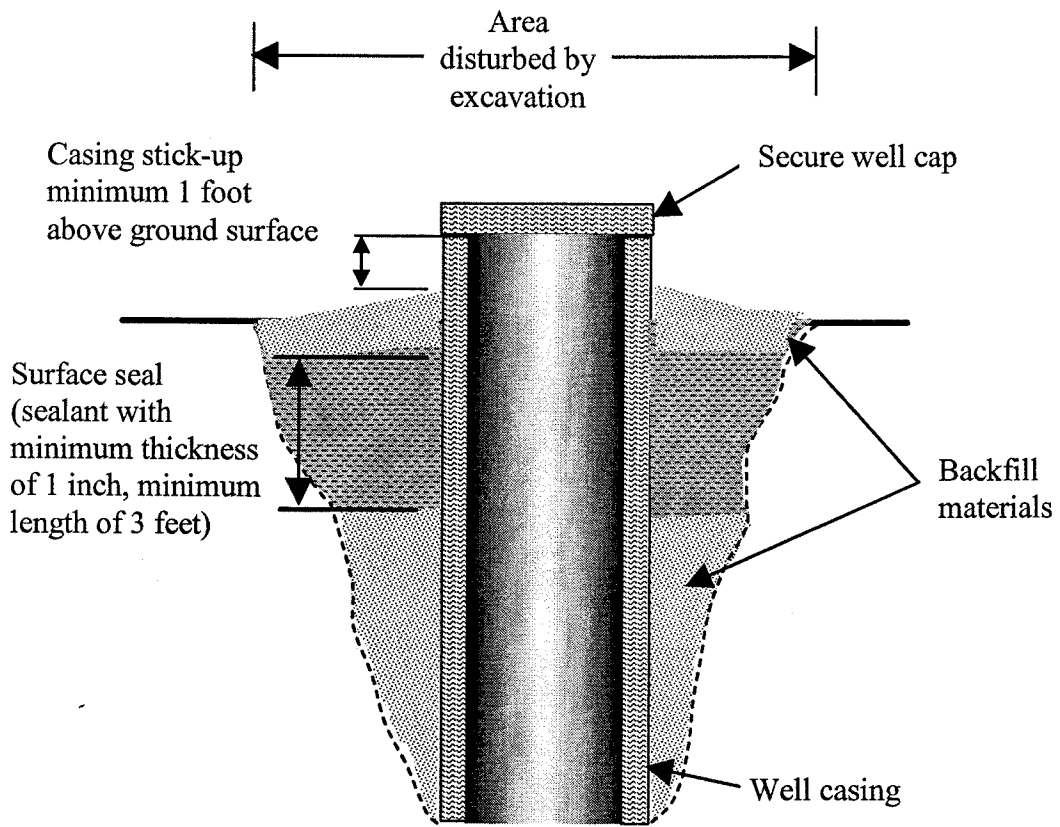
Minimum sealing requirements for excavated wells (for exceptions see Table 1).
